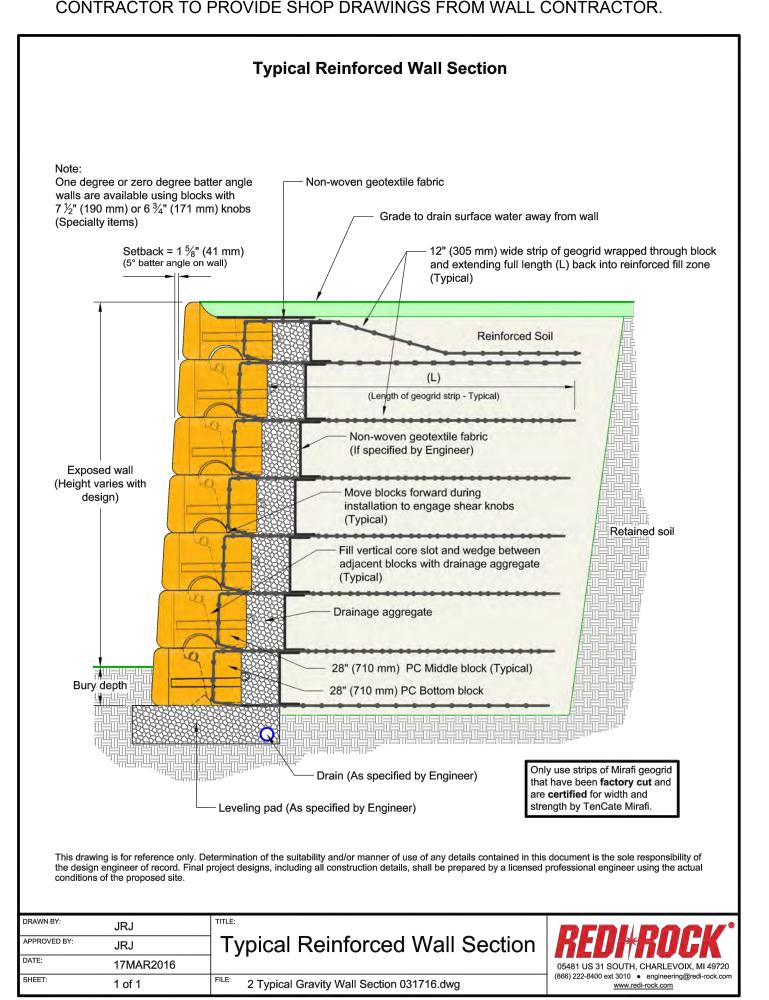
DETAIL PROVIDED FOR REFERENCE ONLY, FINAL WALL TO BE DESIGNED AND CONSTRUCTED PER MANUFACTURERS DETAILS CONTRACTOR TO PROVIDE SHOP DRAWINGS FROM WALL CONTRACTOR.
